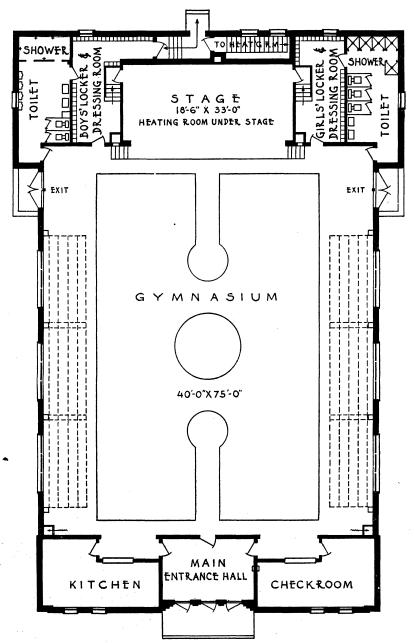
Floor plan of the building at Peshtigo, Wis., showing gymnasium, auditorium, and kitchen. This one-story cinder-block building with concrete floor was built for \$19,800, heating, plumbing, wiring, and fixtures included.
